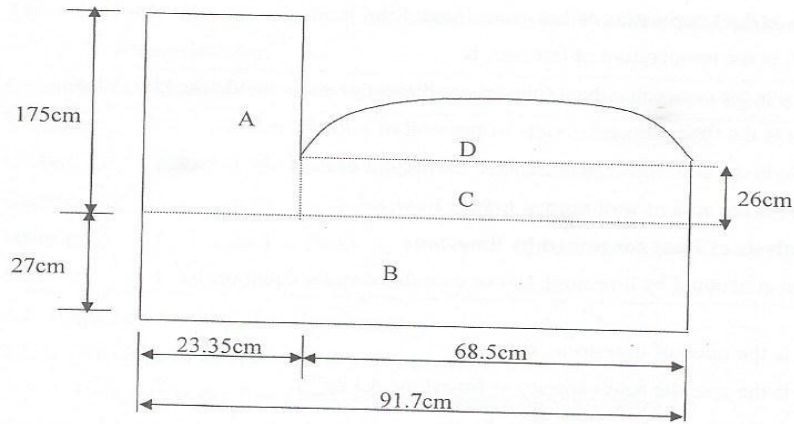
Brick Wall Elevation of Front and Rear View.
